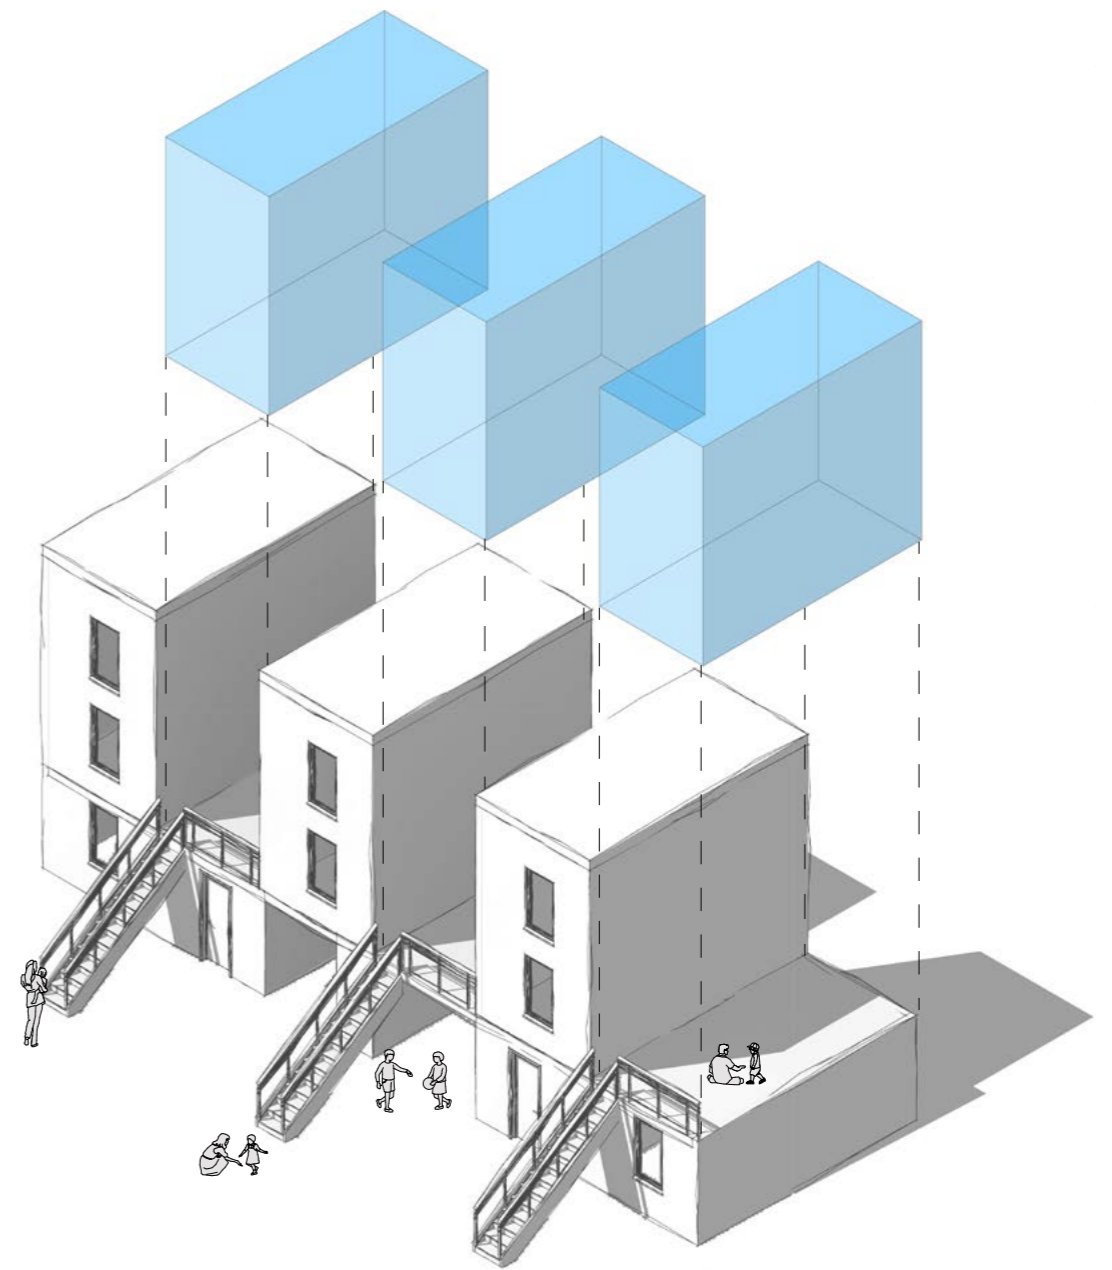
Exploded Axonometric illustrating additive housing block system of Quinta Monroy development
